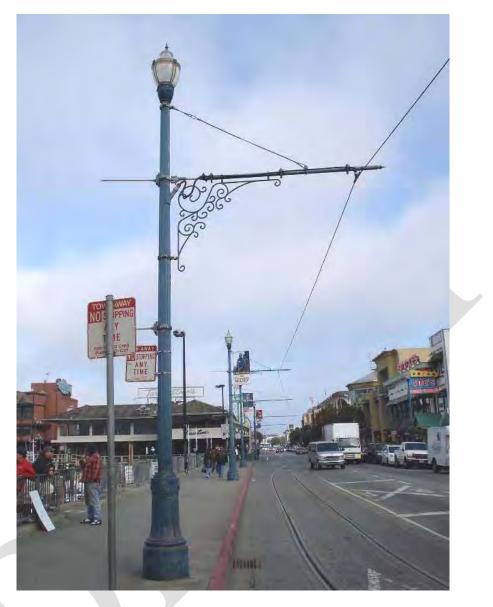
Typical pole with mast arm for OCS suspension for single track (Section shown on Jefferson Street)
